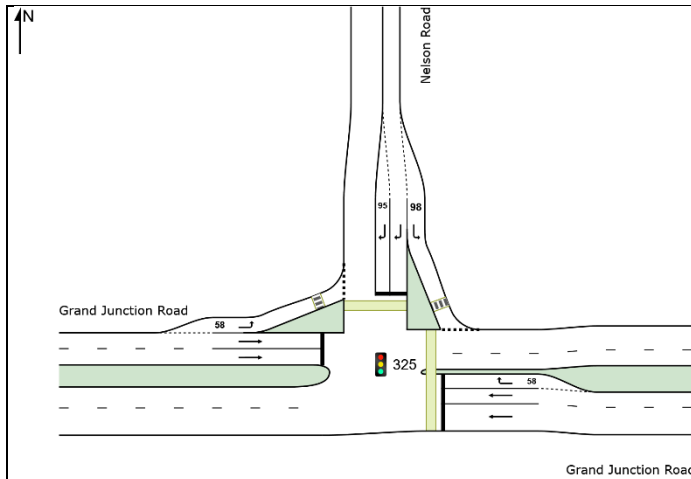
TS325 Grand Junction Road – Nelson Road Site Layout
